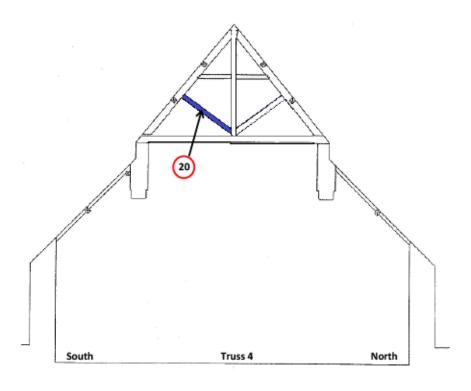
/d: Cross sections of the trusses to show sampled timbers (after Nick Hill)
